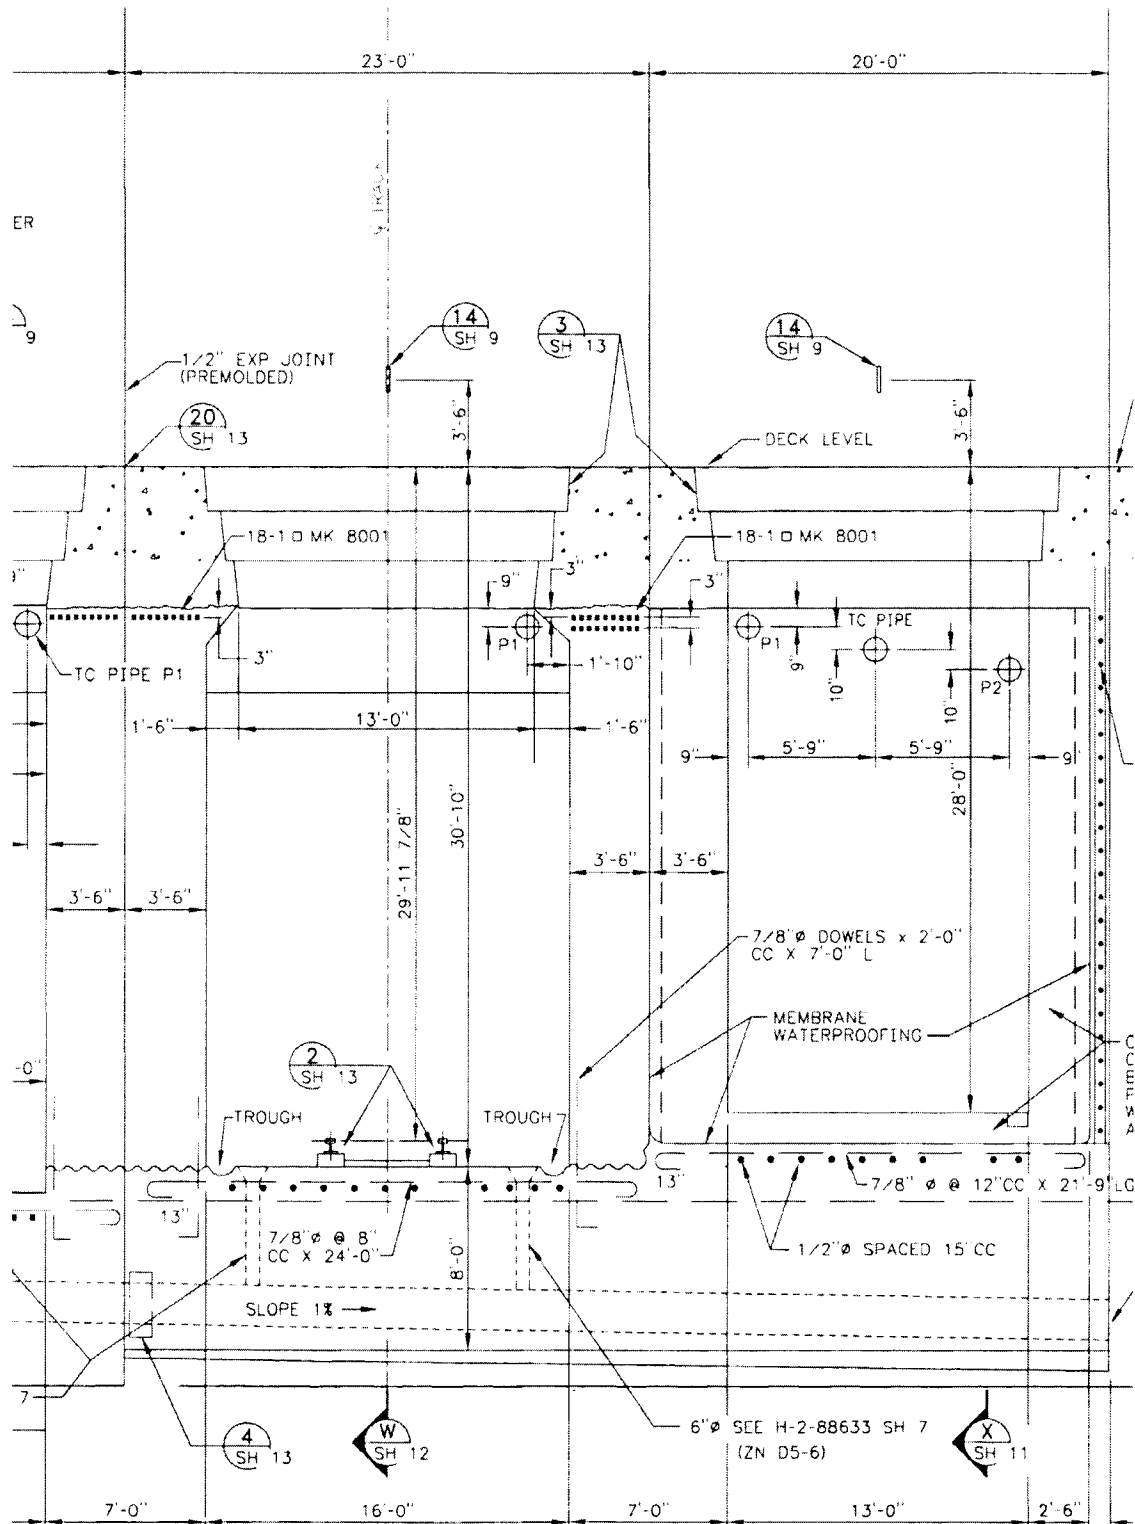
T Plant Cross-Section with STSC Receiving Equipment
